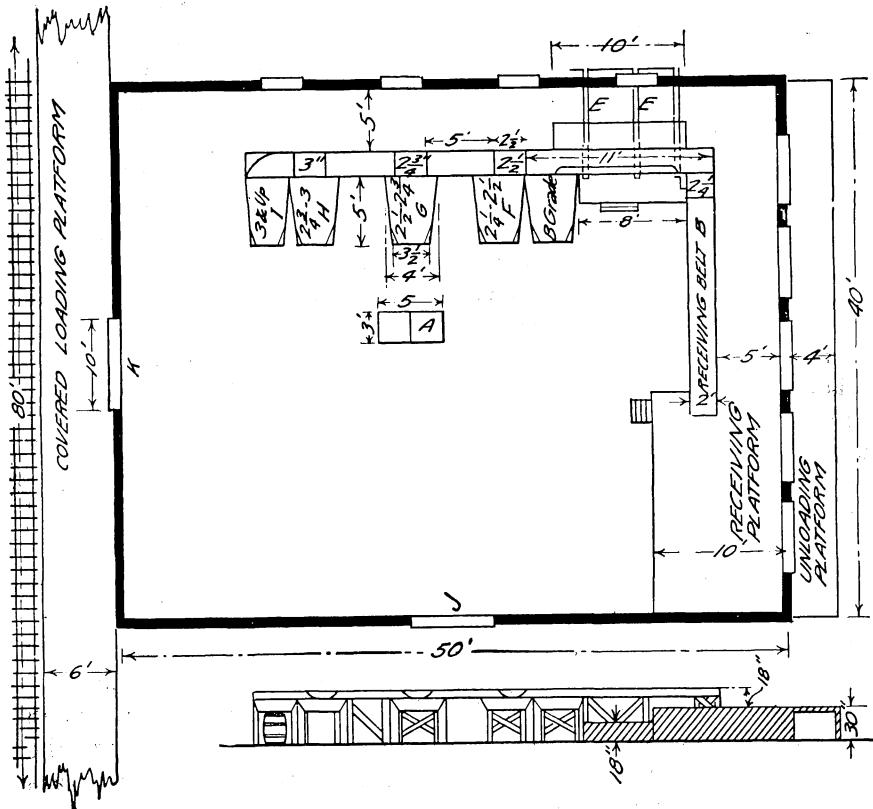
Plan 4: Floor plan of model house fully equipped for barrel packing.
